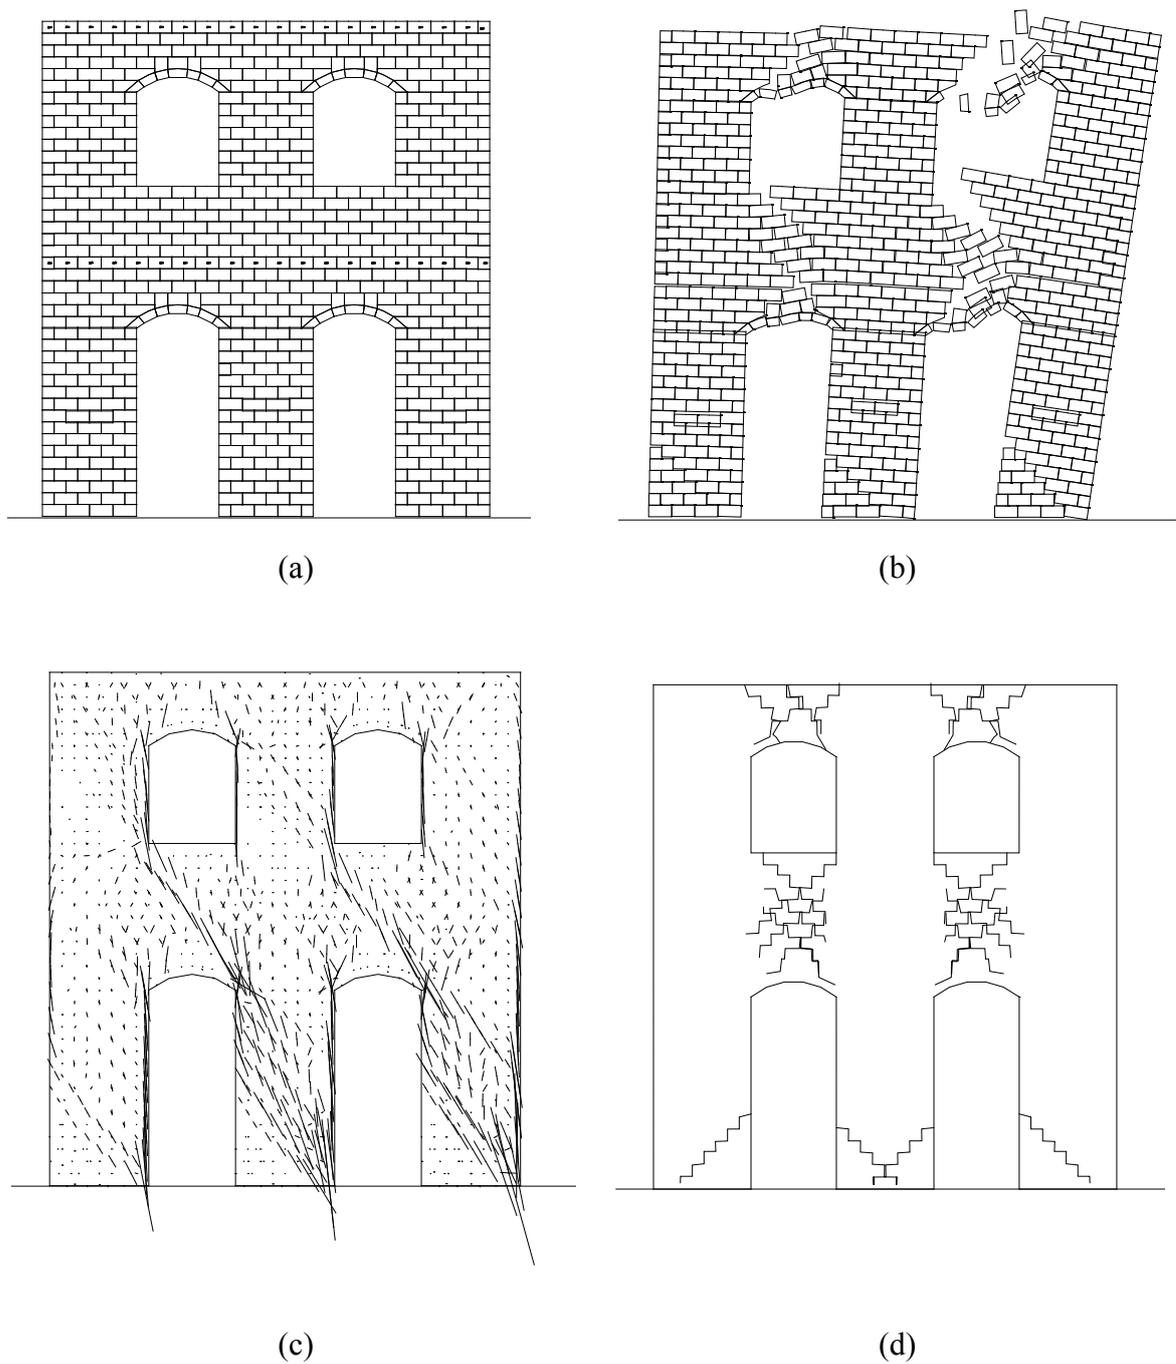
Standard Masonry wall 1 under Overload condition; Seismic coefficient,  $\alpha=0.660$ , (a) Block model, (b) Failure mechanism, (c) Cracks formed, (d) Thrust lines
